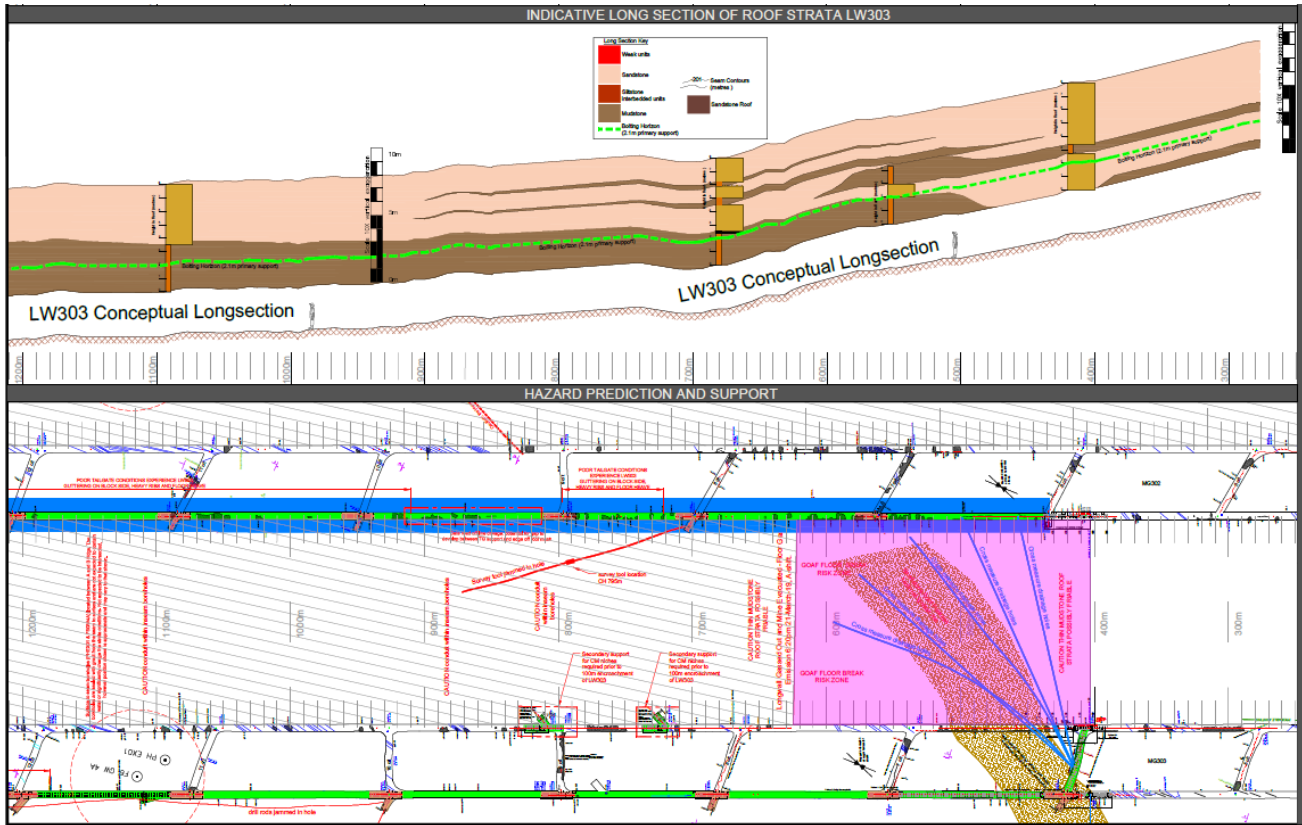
Longwall 303 hazard prediction plan and conceptual long section
